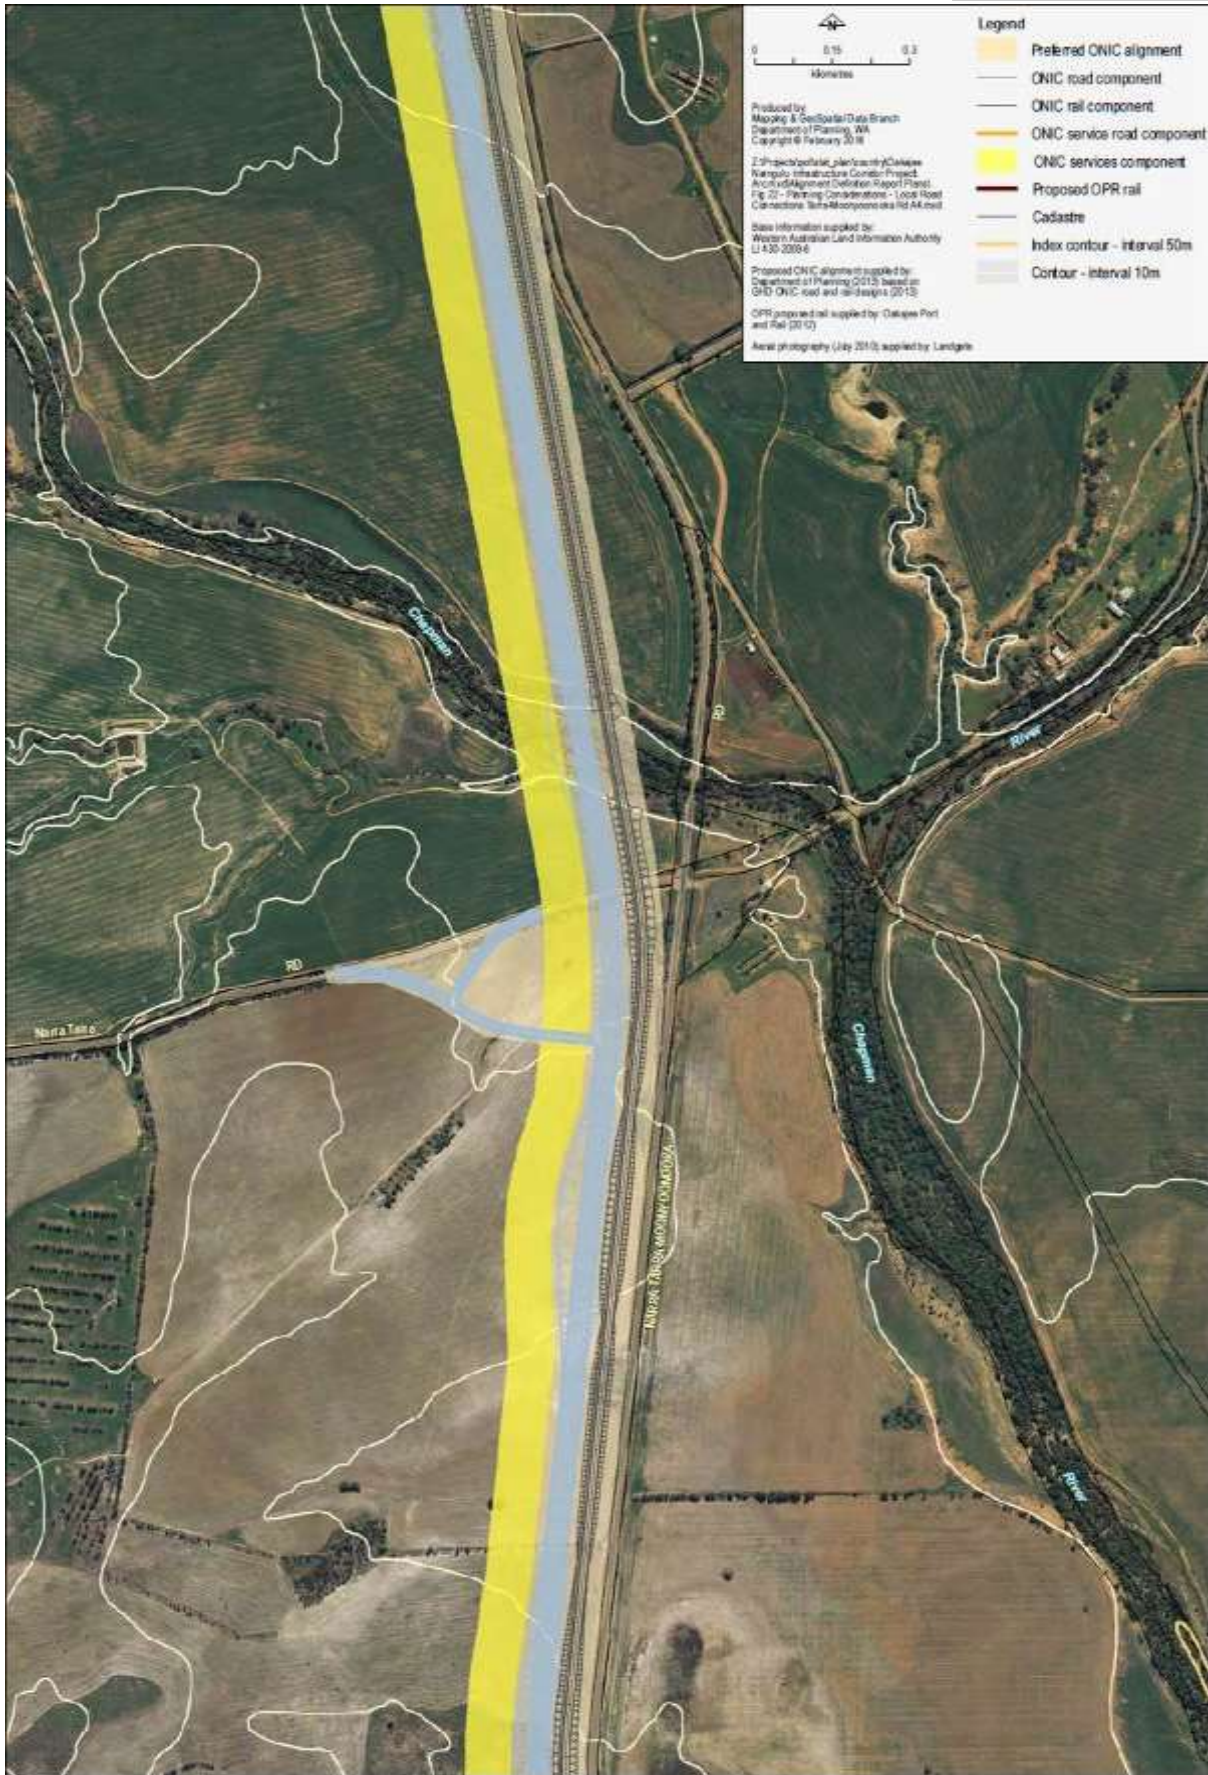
Planning considerations - Local road connections Narra Tarra Road
